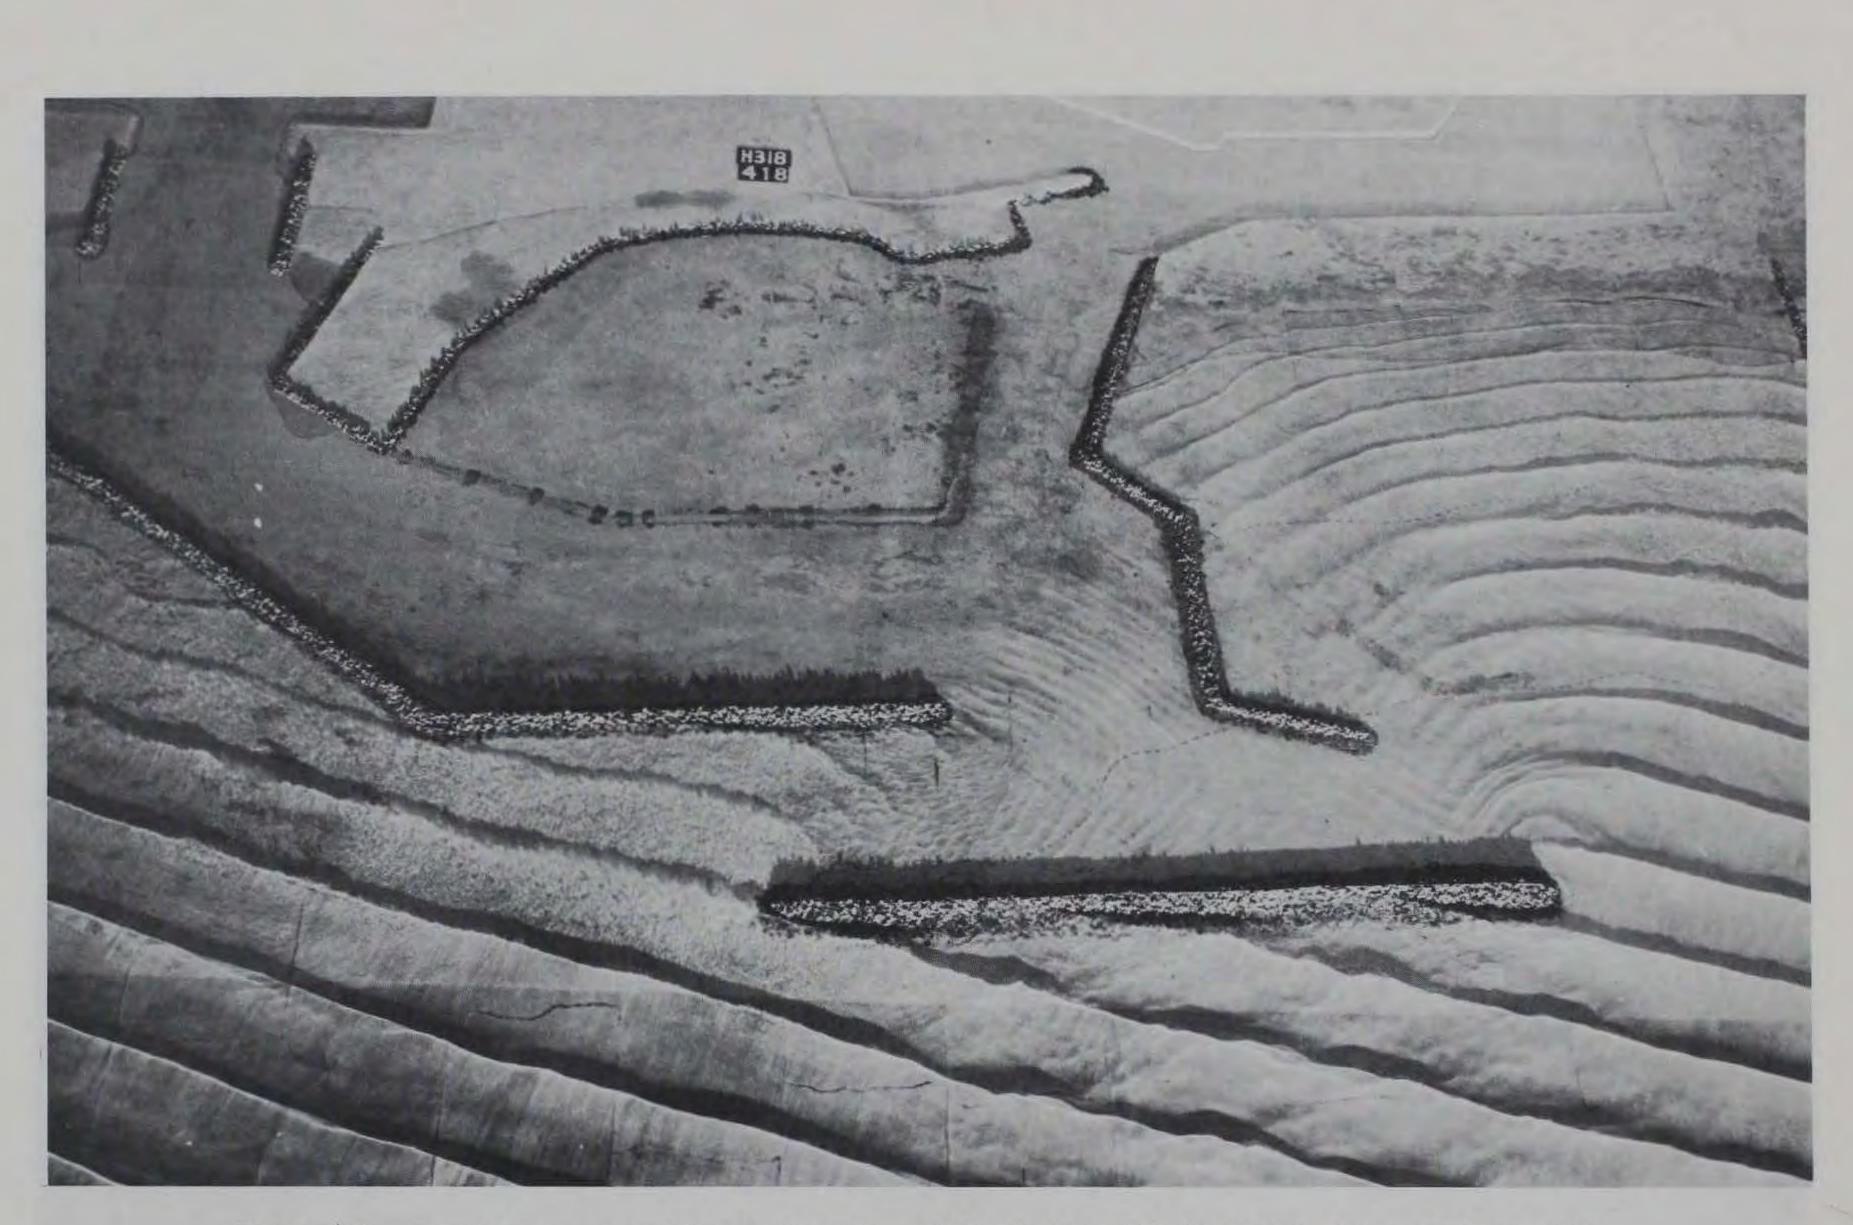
Typical wave patterns for Plan 31F; 9-sec, 12-ft waves from west at mhhw
